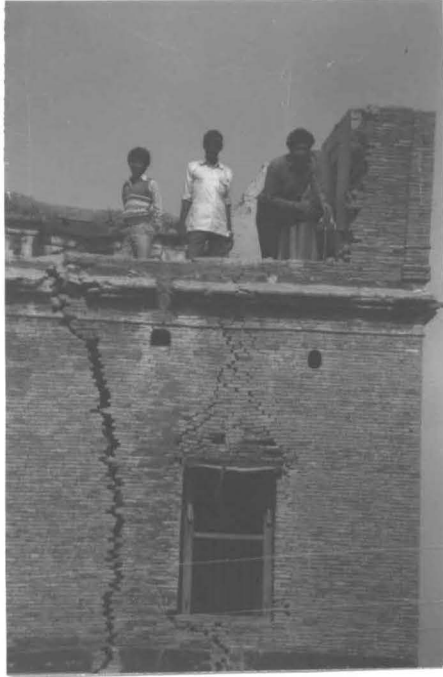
Wide Crack in wall and tilt measurement
